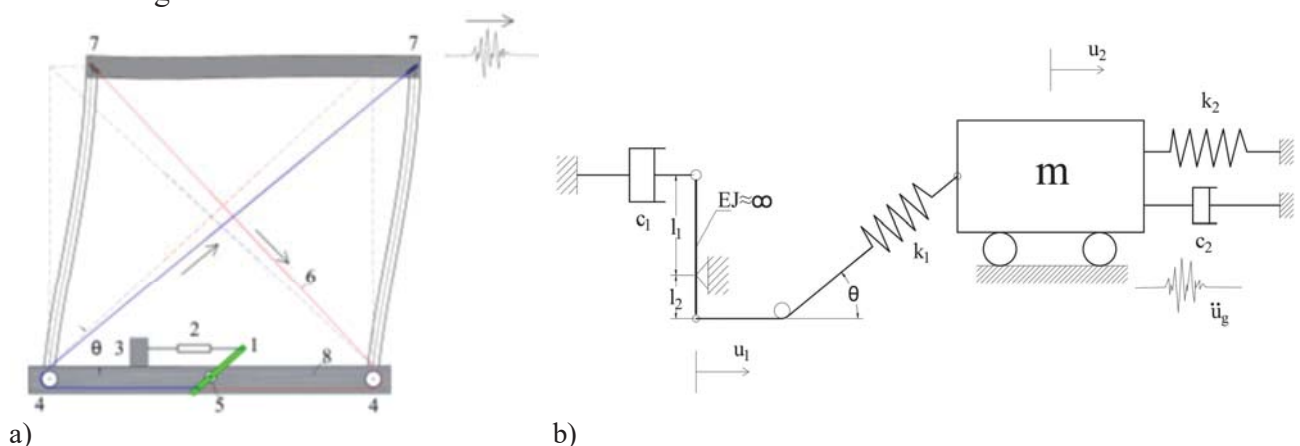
a) Conceptual model of simple 1-floor frame structure equipped with proposed system: 1 lever arm; 2 viscous damper (VD); 3 contrast; 4 pulleys; 5 pin; 6 wire; 7 clamp; 8 foundation; b) Mechanical model of a 2-DOF structure equipped with the proposed system.
